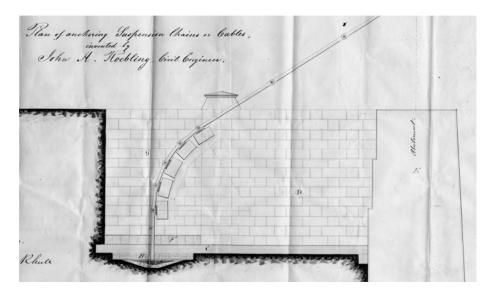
Patent: Improvement in anchoring suspension chains for bridges, 26.08.1846 (TR OZ D5 F30)
